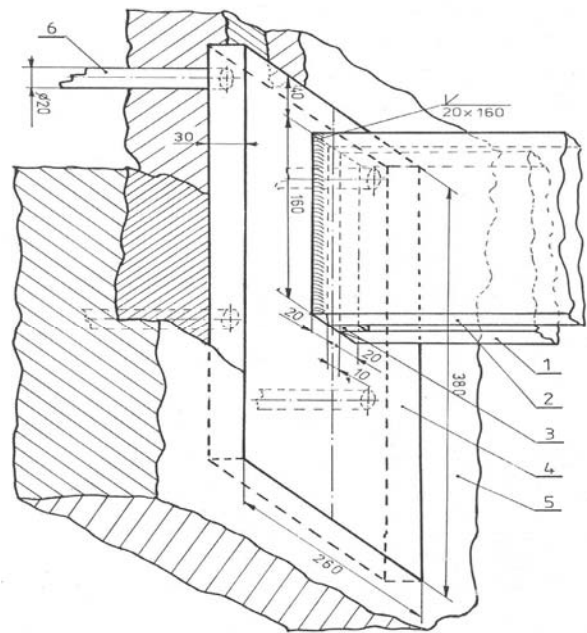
A view of the joint of plate girders and the insert plate prepared for a study: 1, 2 – a plate girder, 3 – a distance backing of plate girders, 4 – an insert plate, 5 – a steel reinforced concrete composite structure, 6 – anchor bars welded to the insert plate
